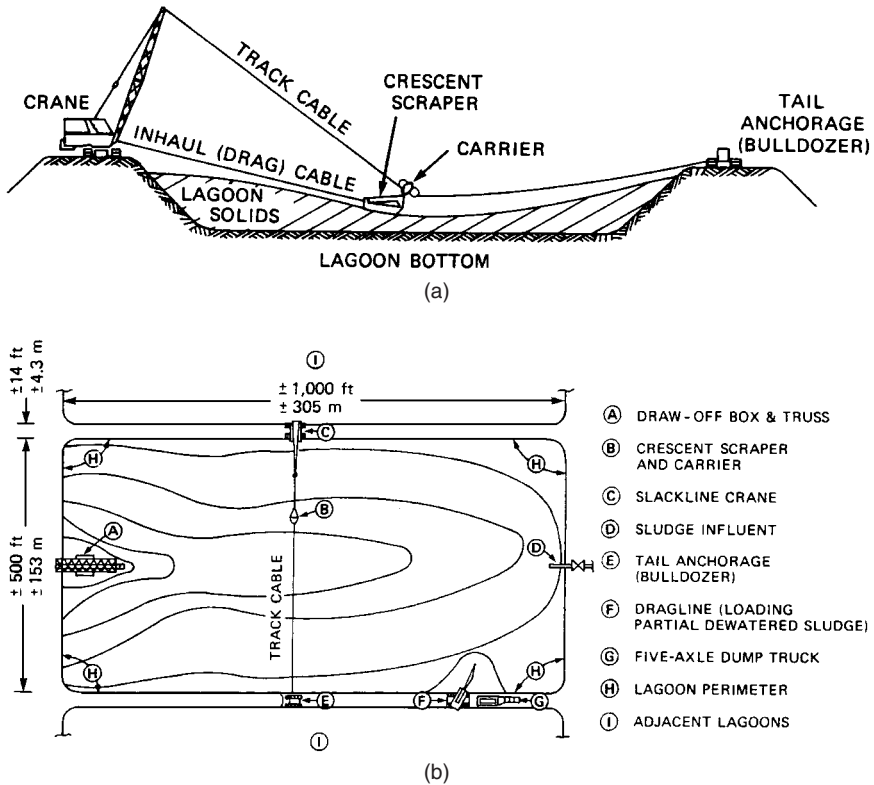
Sludge drying lagoon for West-Southwest Sewage Treatment Works, Chicago. (a) Cross-sectional view. (b) Plan view. Note the drag line for removal of surface crust and dewatered sludge.
